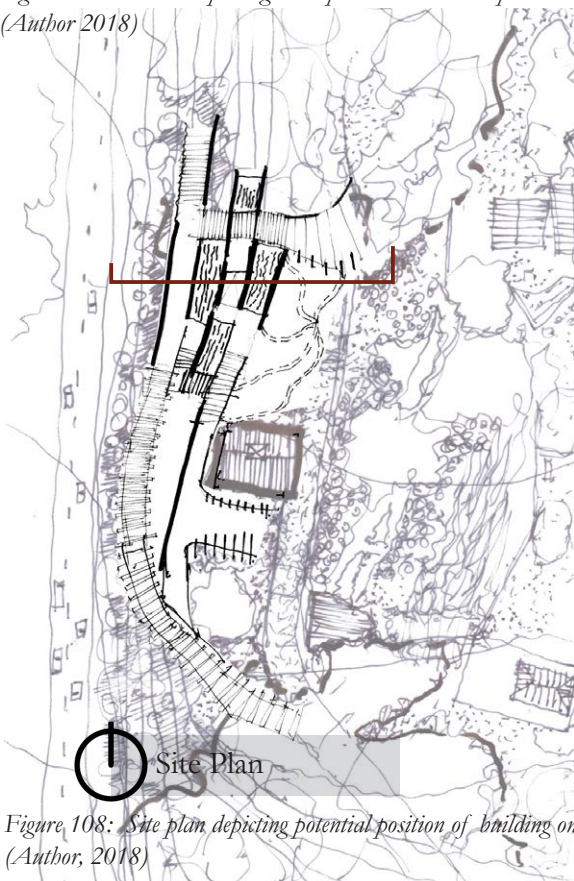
Site plan depicting potential position of building on site (Author, 2018)
